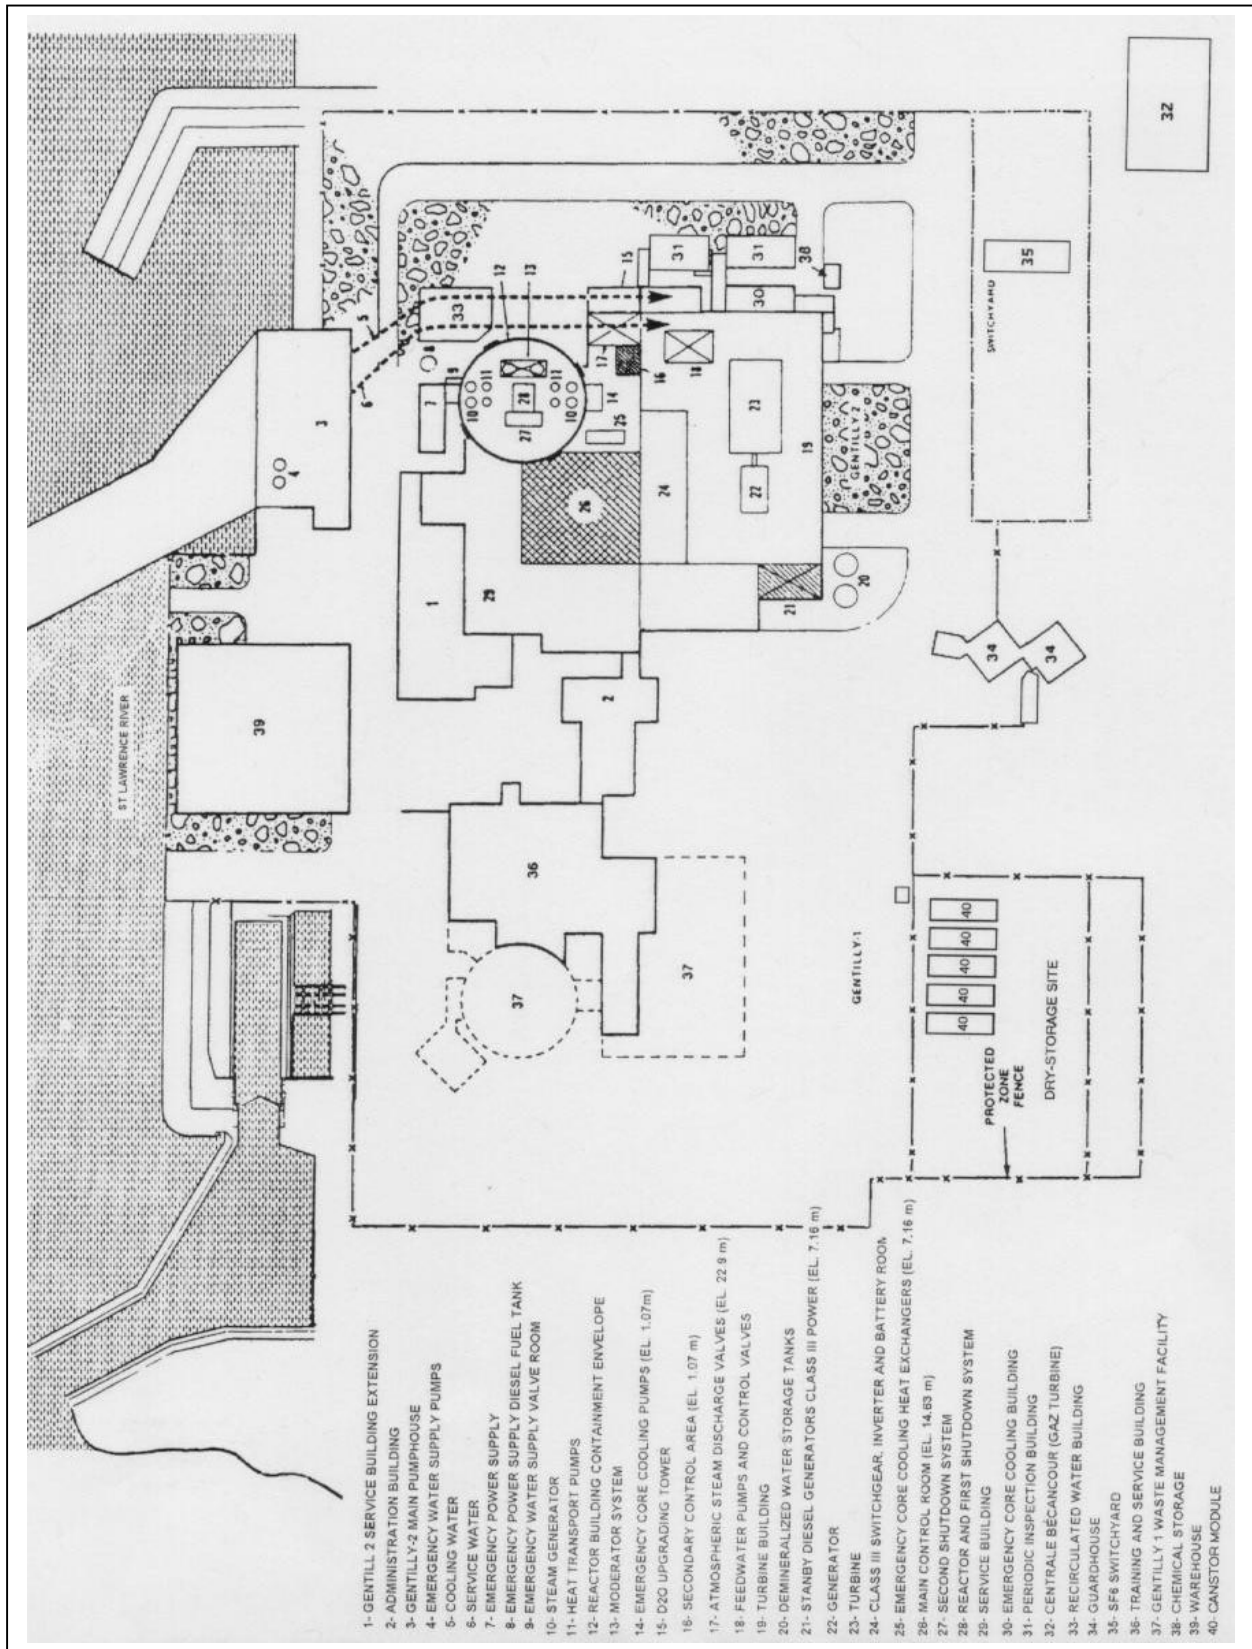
LAYOUT OF PLANT STRUCTURES
